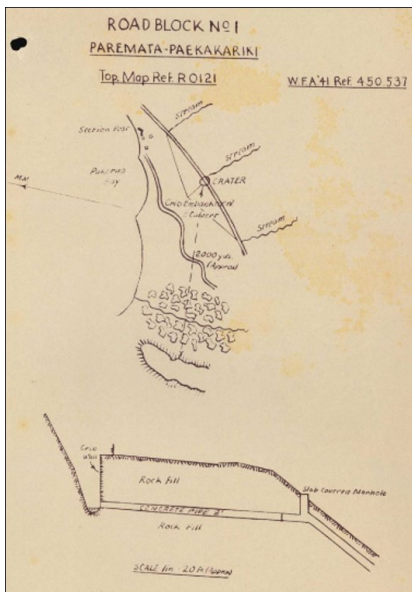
Road block no 1, Pukerua Bay. Archives NZ, AAYS, 18640, 13/4/2
